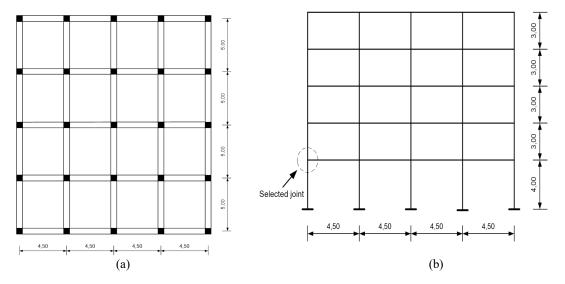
Details of the building: (a) plan of the building, (b) elevation of the transverse frame with the joint selected
